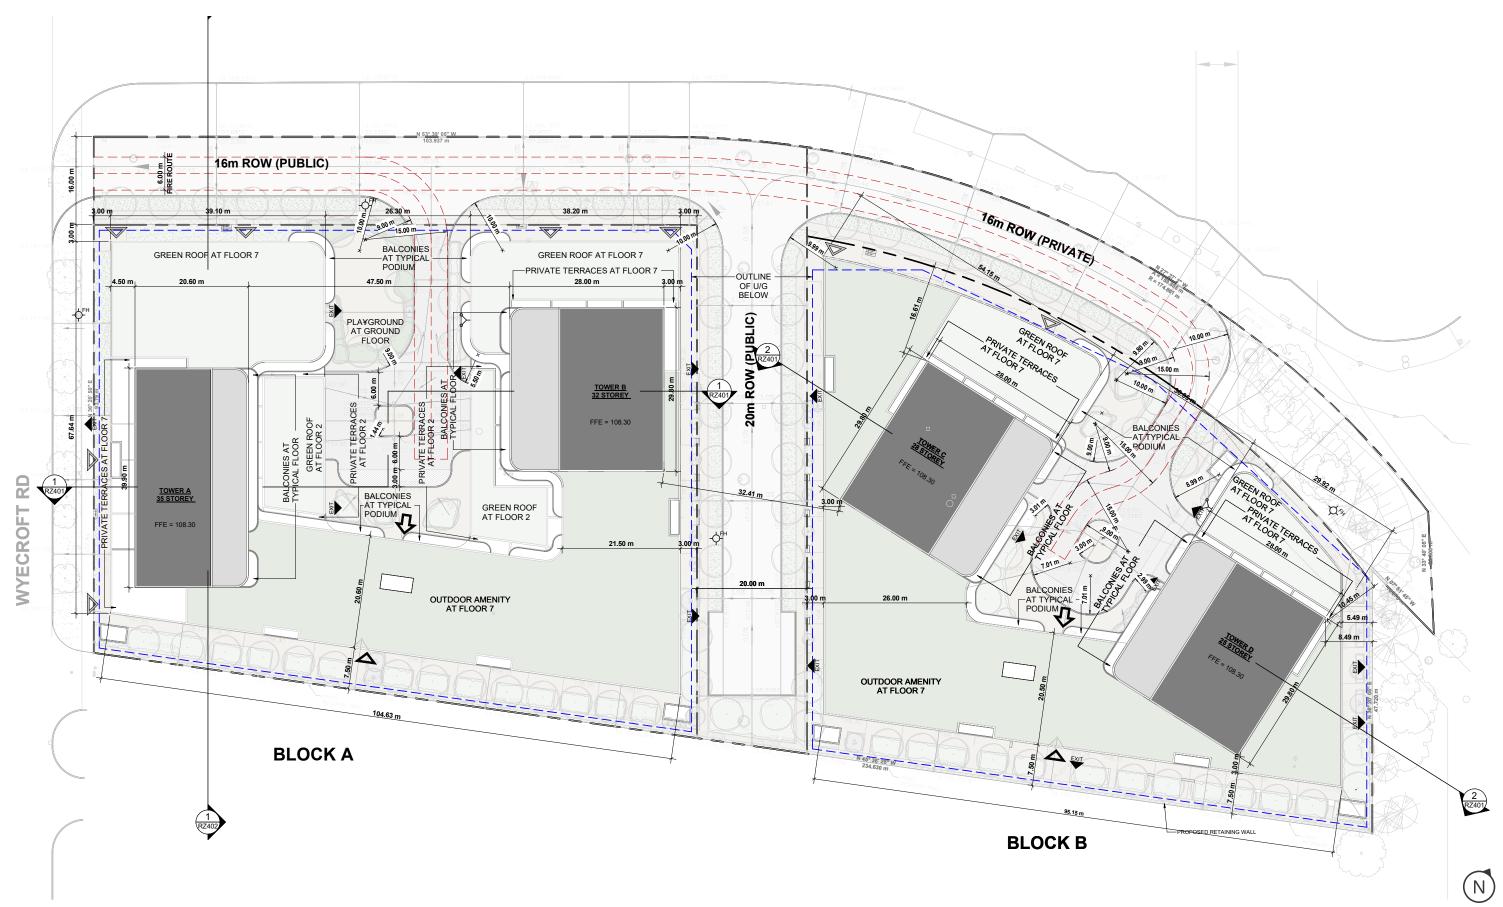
Proposed Concept Plan (Prepared by Turner Fleisher, July 2025)
